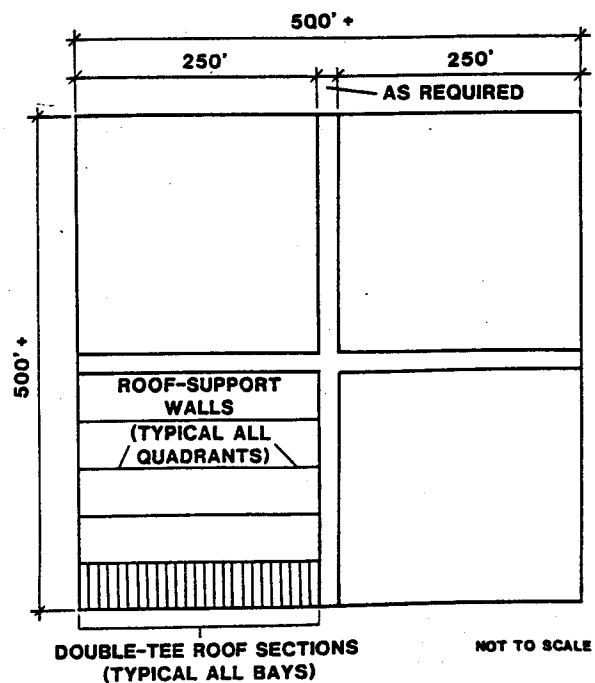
Roof framing plan for four adjacent buildings showing arrangements of roof panels and supporting walls.
